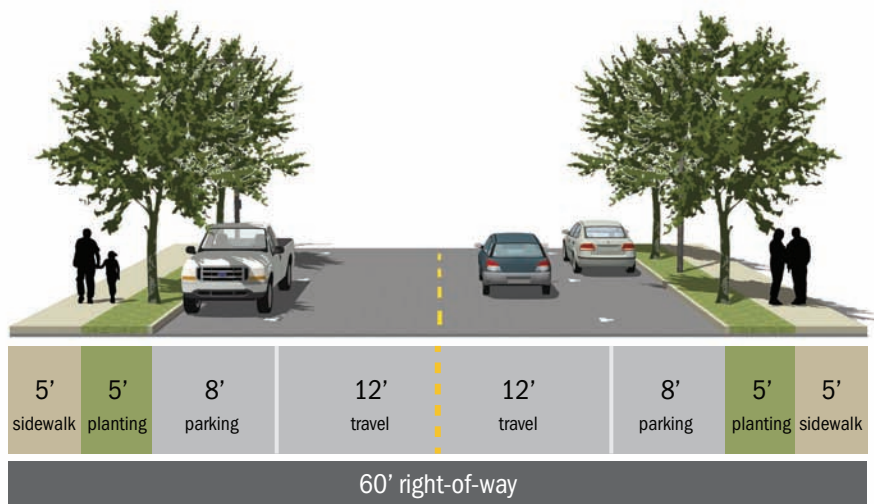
Proposed Conceptual Cross-Section for Local Streets with a 60' right of way
